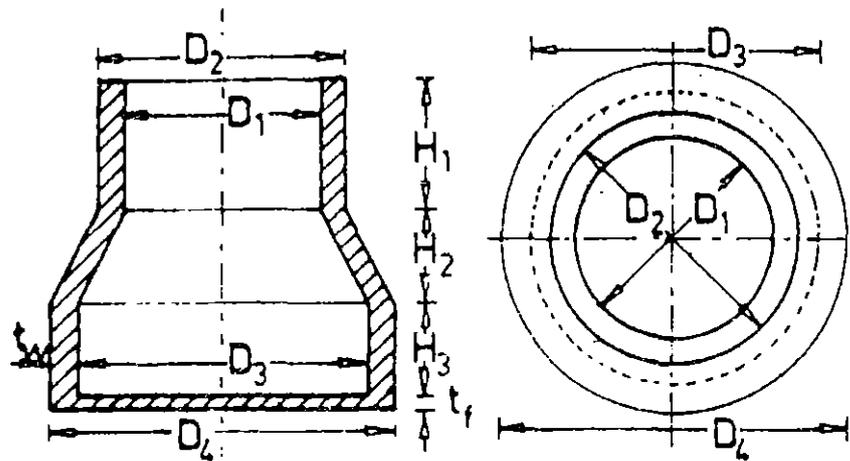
The Shape of a Taper Type Steel Drum Biogas Plant
